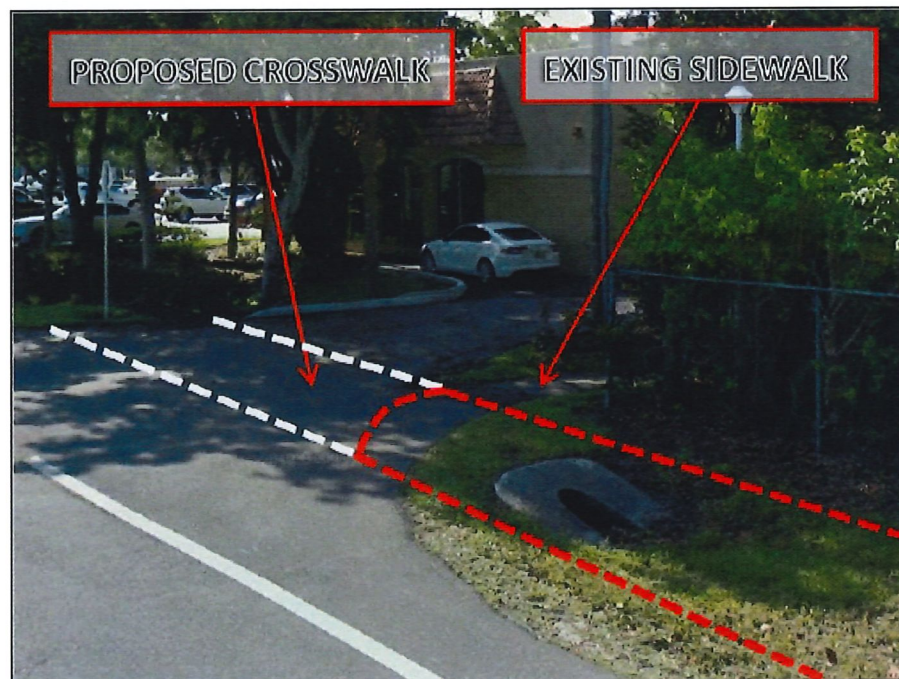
91st Avenue N and Rear Entrance at 9051 Tamiami Trail N Sidewalk Alignment and Crosswalk
